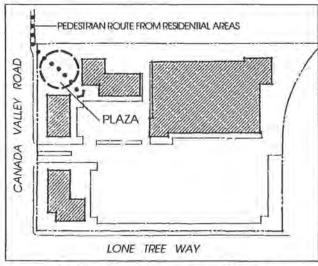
Illustrative plan, Lone Tree Way retail center.
